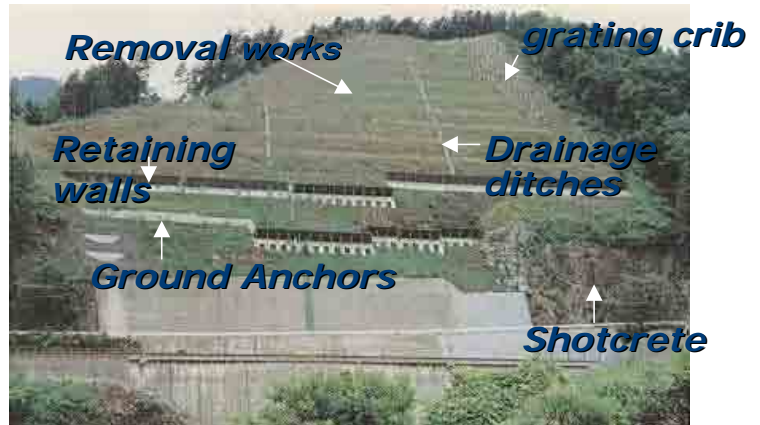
Example of mitigation measures in Japan\*<sup>1)</sup>
